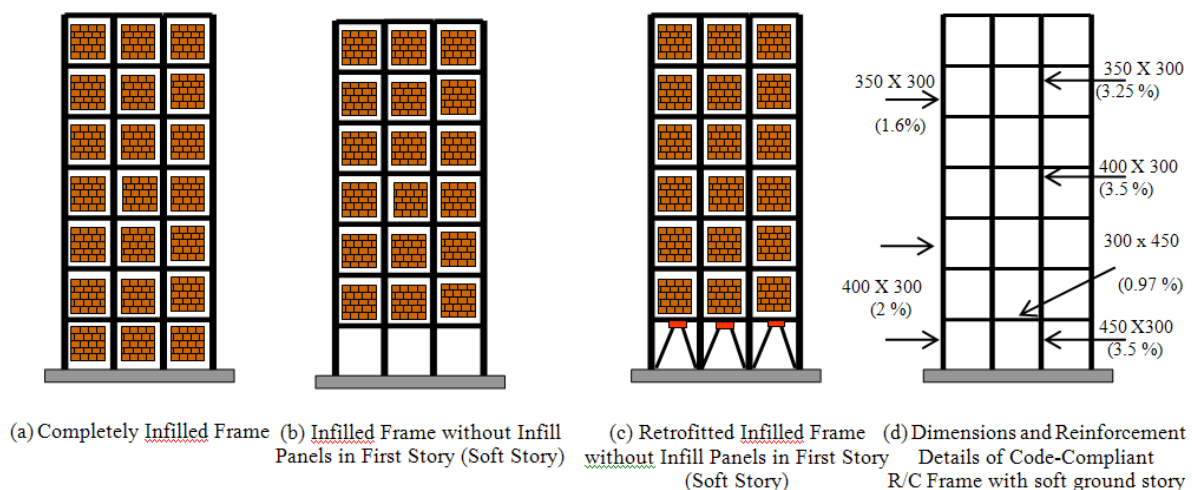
Practically Relevant Distributions of Masonry Infill Panels along the Elevation of Planar Masonry Infilled Reinforced Concrete (R/C) Frame and Details of Code Compliant Masonry Infilled R/C Frame with soft ground story
